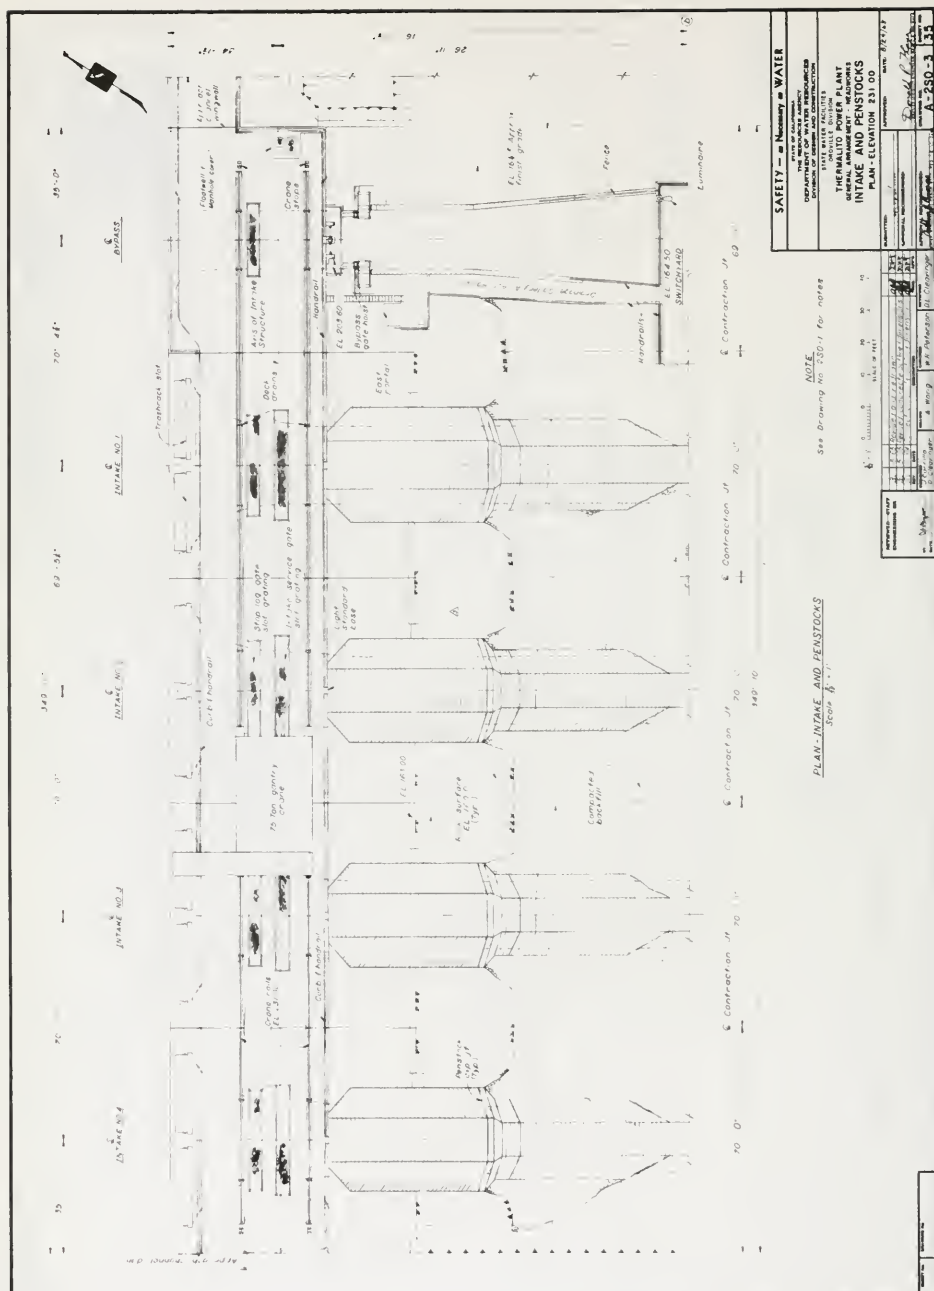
Intake and Penstocks—Plan—Elevation 231.0
